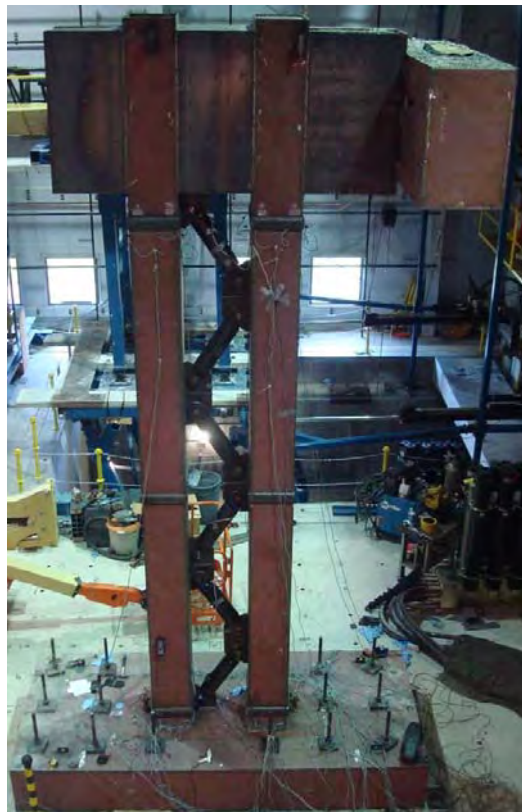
Twin Column Specimen S2-1 with BRBs Prior to Testing (El-Bahey and Bruneau, 2010)
